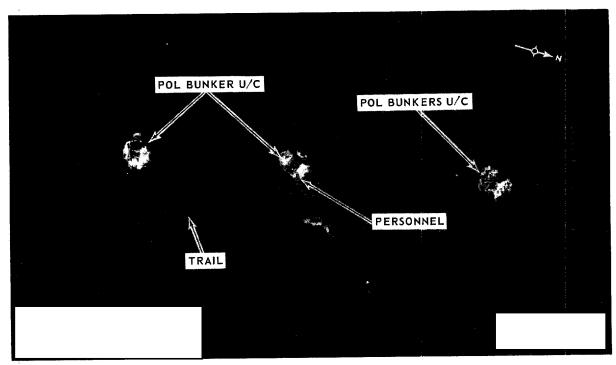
POL STORAGE AREA UNDER CONSTRUCTION, DONG HOI AREA, NORTH VIETNAM.
